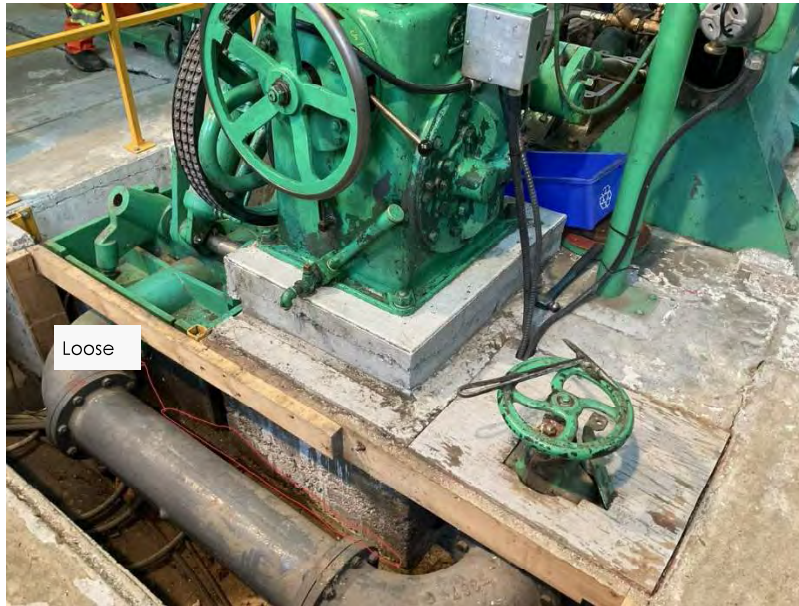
Loose and degraded concrete under the block concrete and inside the trench
